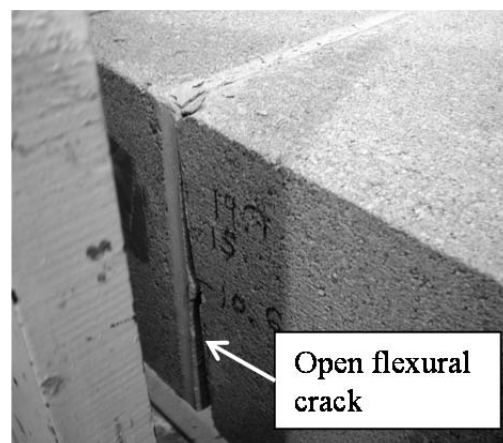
Typically Observed Failure Mode for the Wall Splice Specimens
